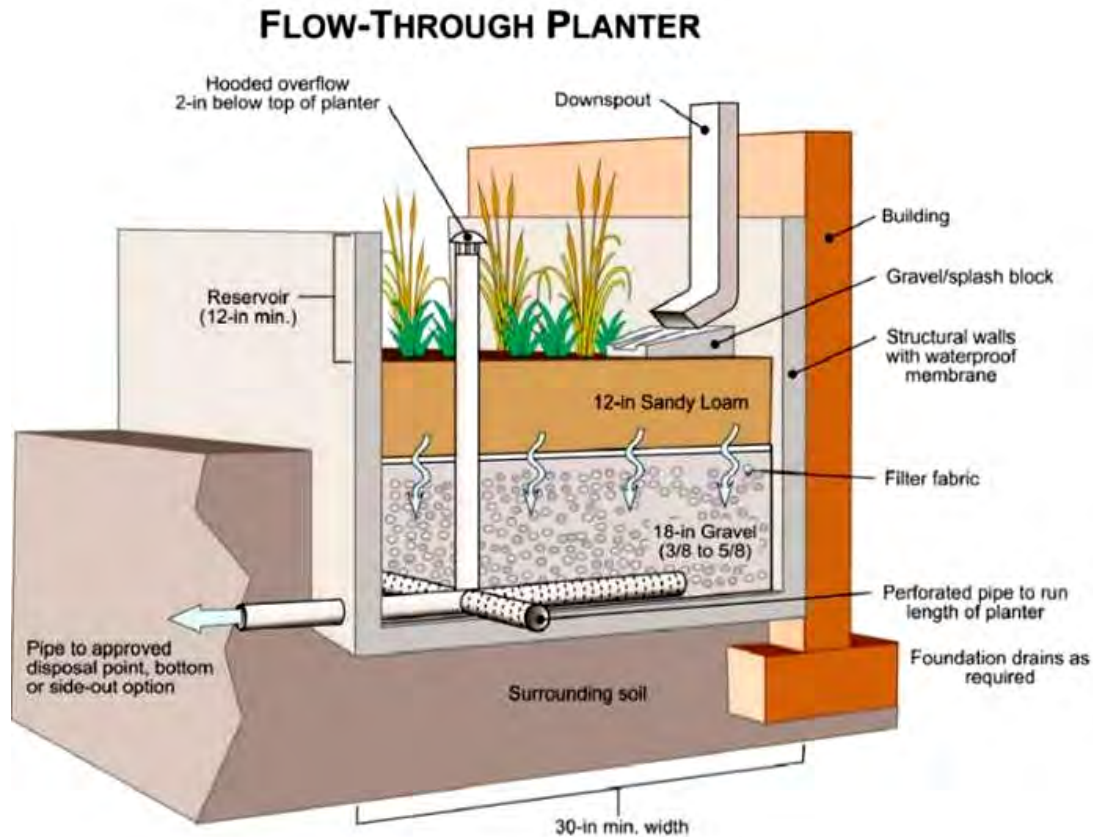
Schematic of a storm water planter that detains and treats roof runoff, and drains and overflows to the conventional storm drain system via an underdrain and overflow pipe system.
